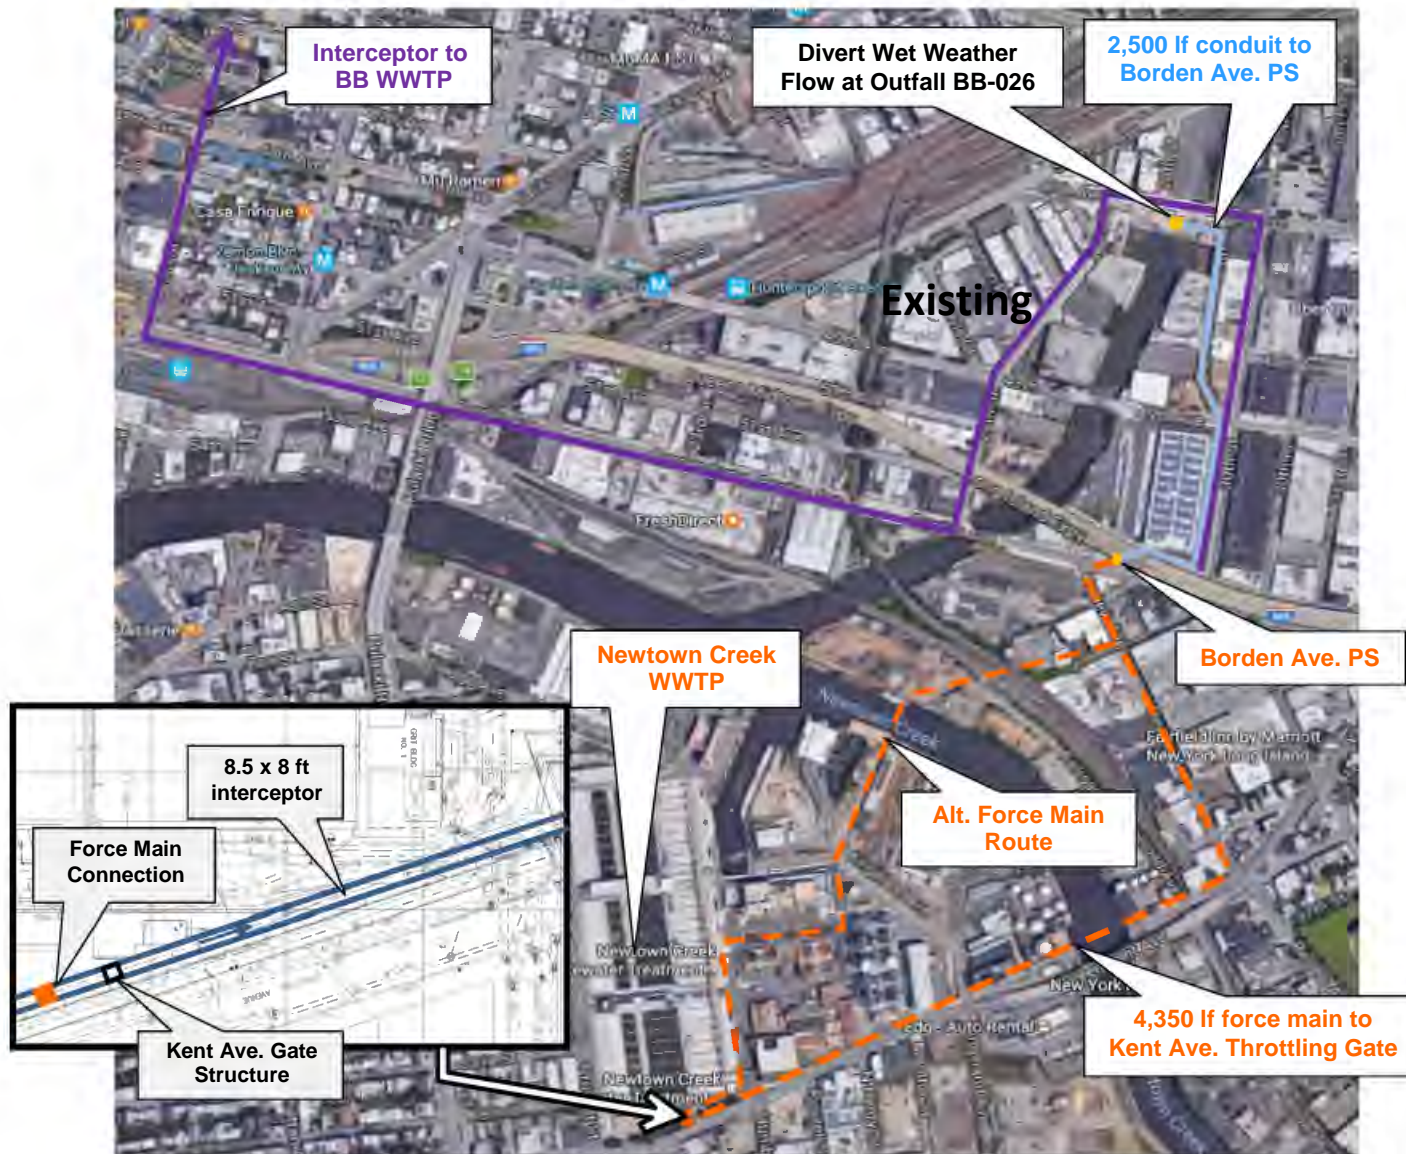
Borden Avenue Pump Station Upgrade/Expansion Layout
